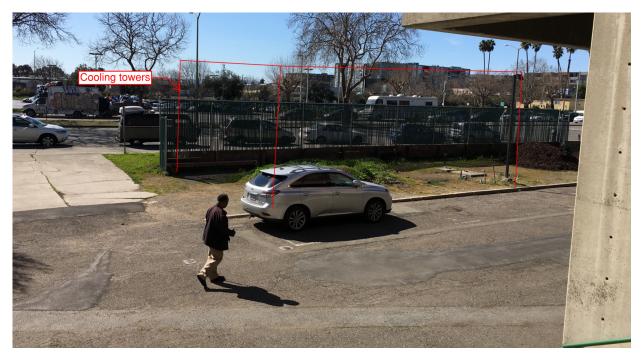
Field image of potential cooling tower location adjacent to Building F. Location 3.
